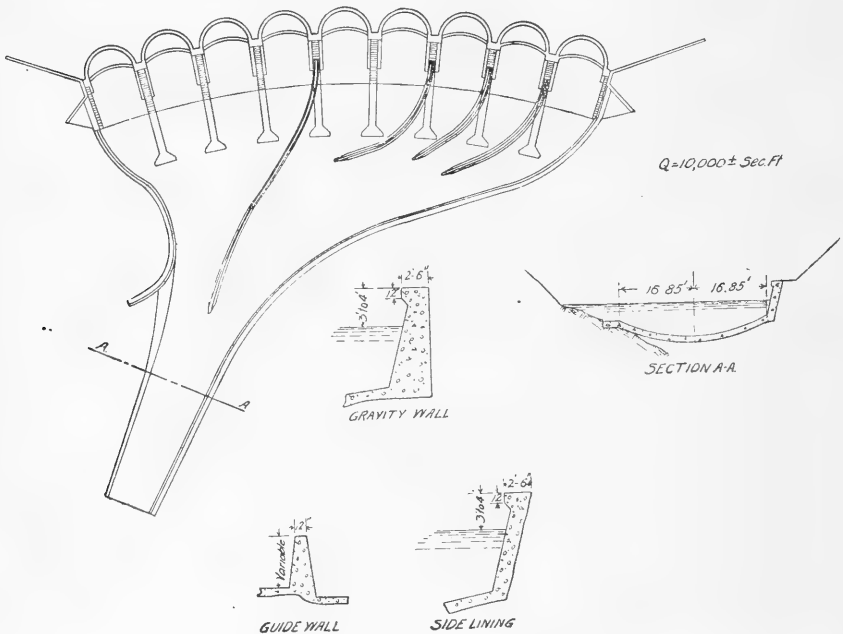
Plan and cross section of East Park reservoir spillway, Orland project, California. Form of dentated type of spillway composed of a series of nine piers, each 8 feet wide.
